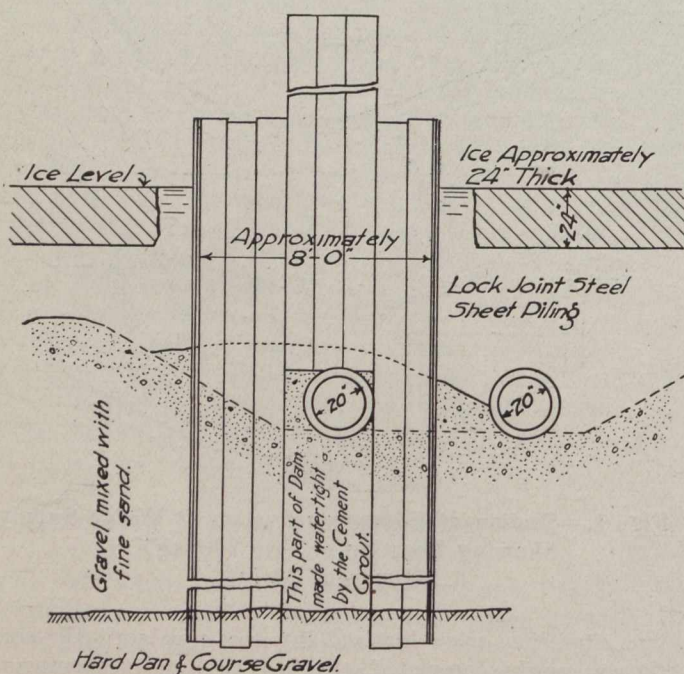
Sketch of Cofferdam Constructed Around the Section of Broken Pipe.
